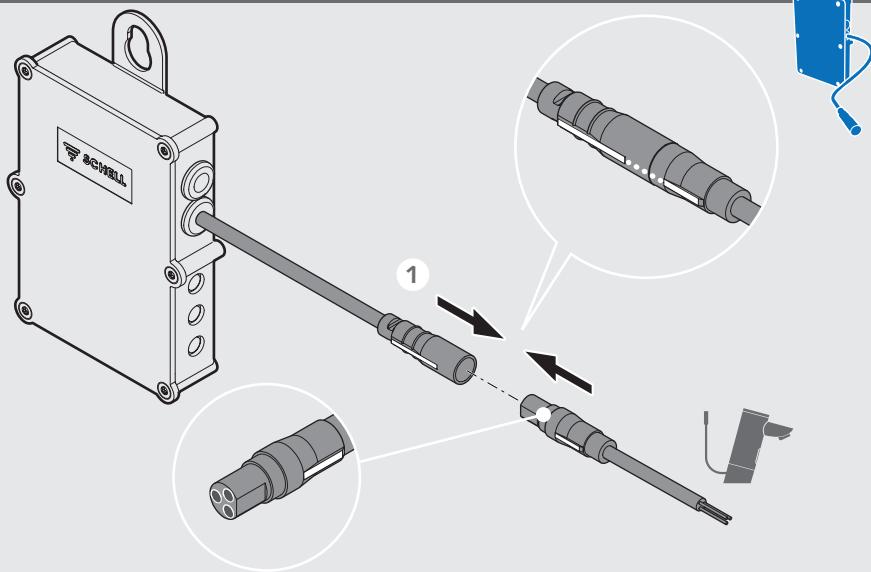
Connect eSCHELL cable bus extender BE-K to fitting
